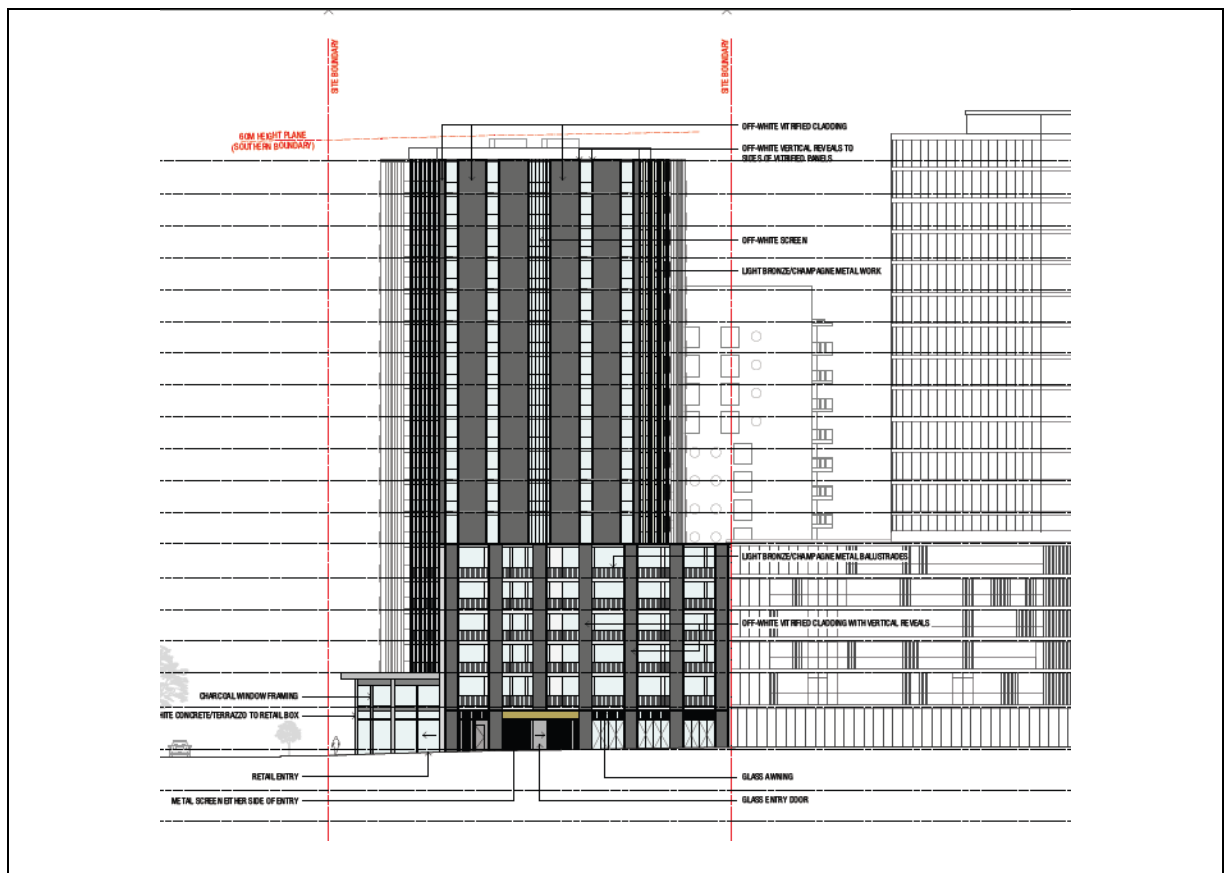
Distance separation, demonstrated by the southern elevation/Oxford Street elevation
